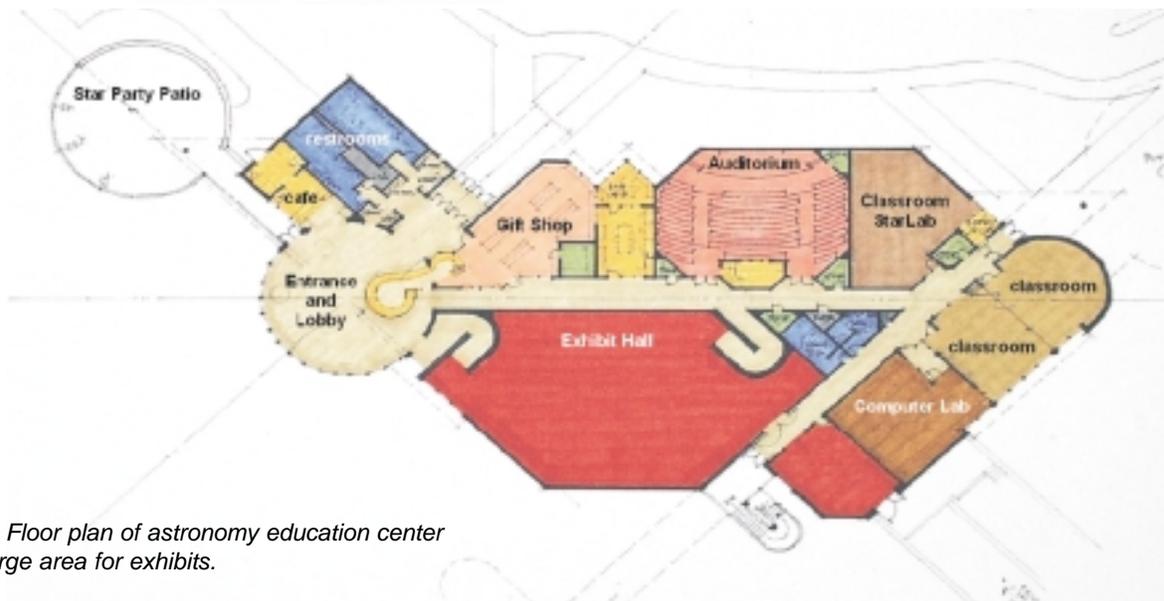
Floor plan of astronomy education center shows large area for exhibits.
